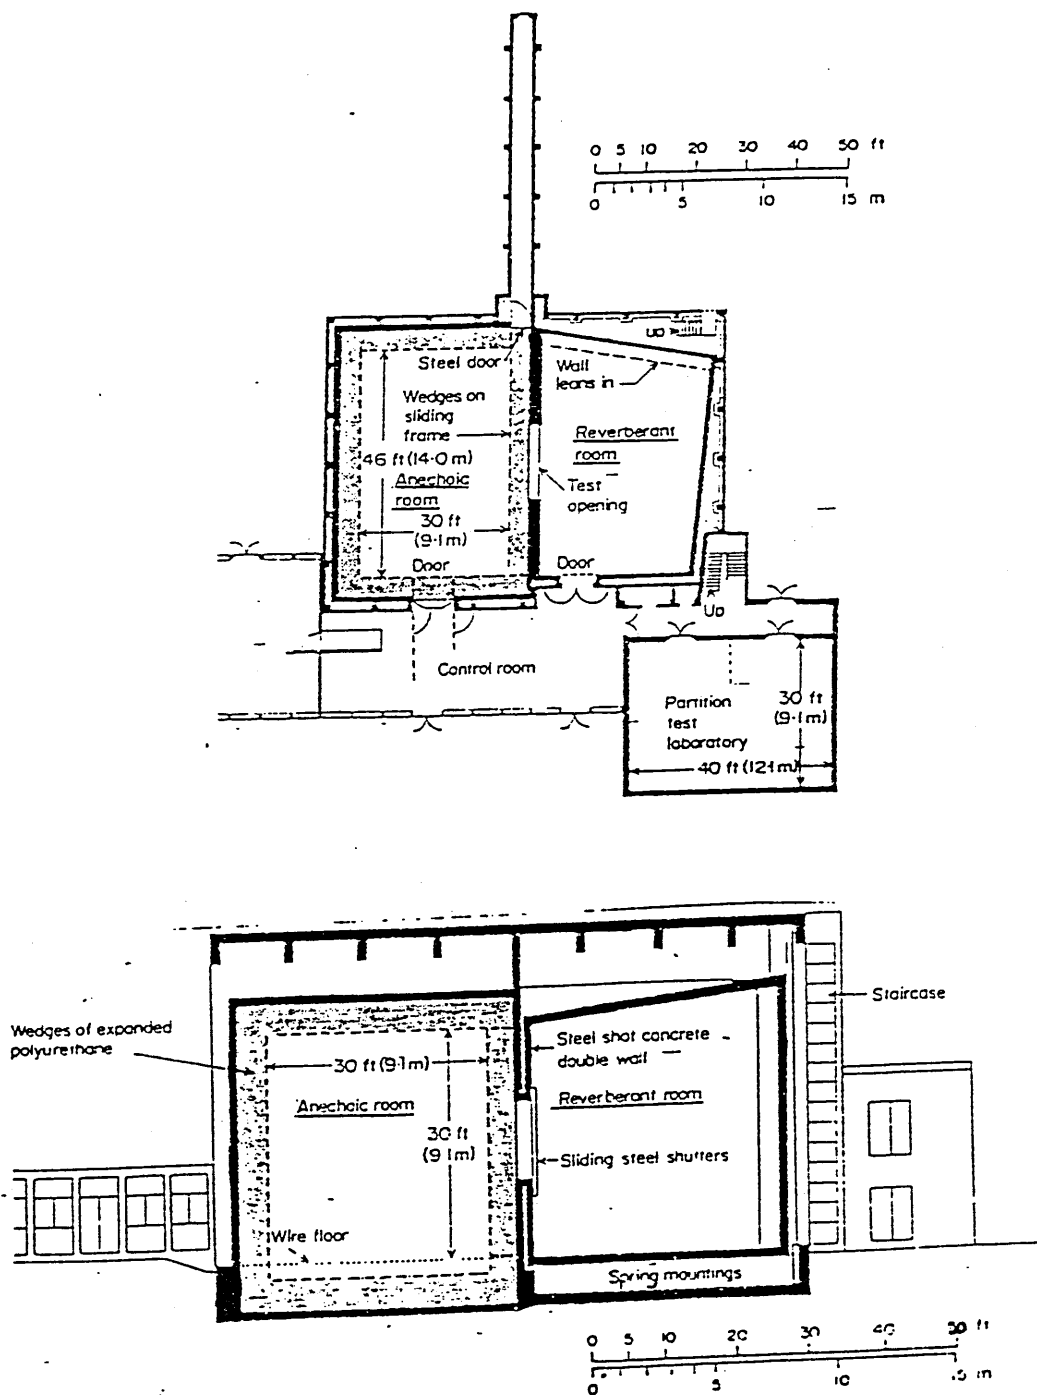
Plan of the reverberation and anechoic rooms (aerial) and section through the rooms.
